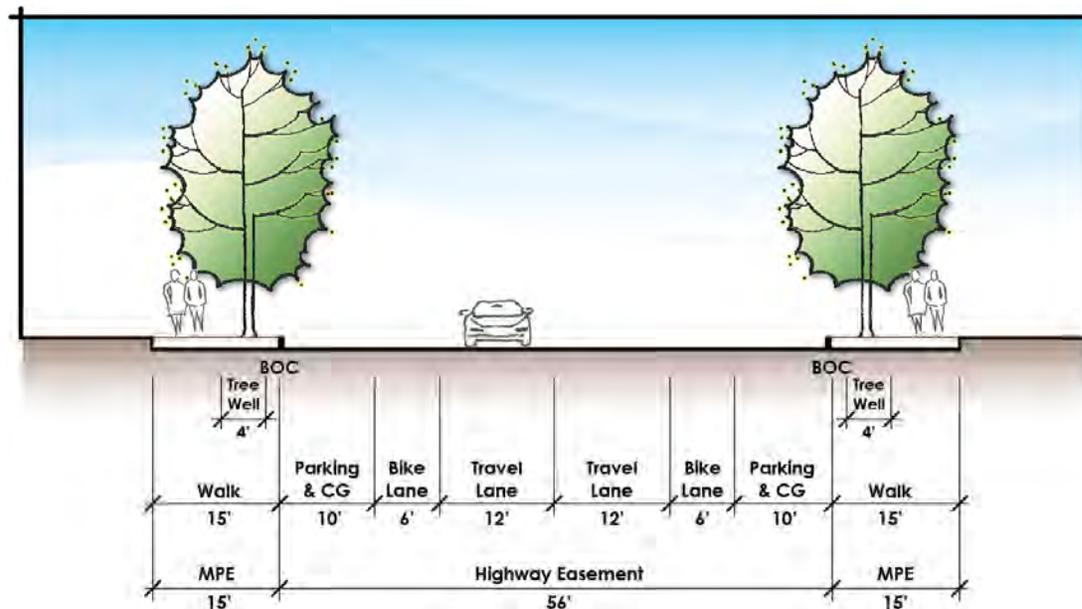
B: TOWN CENTER LANE (DESIGN ALTERNATIVE WITH BIKE LANES)
